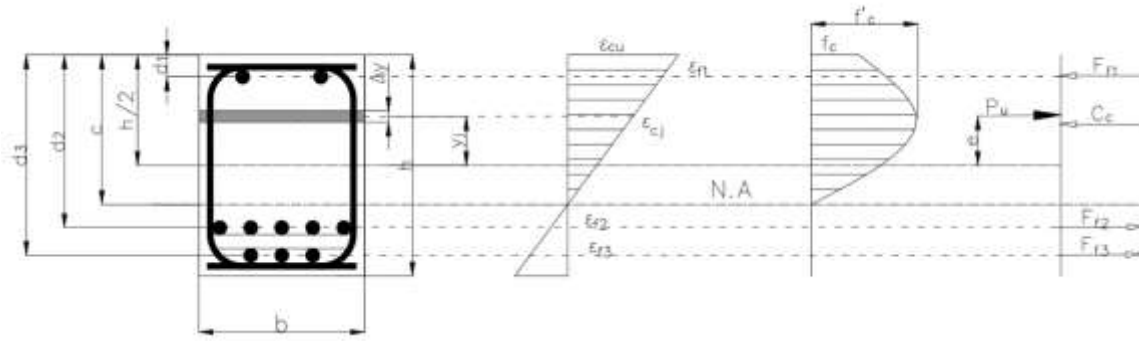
Stress and strain profile of GFRP-reinforced concrete beam cross-section
